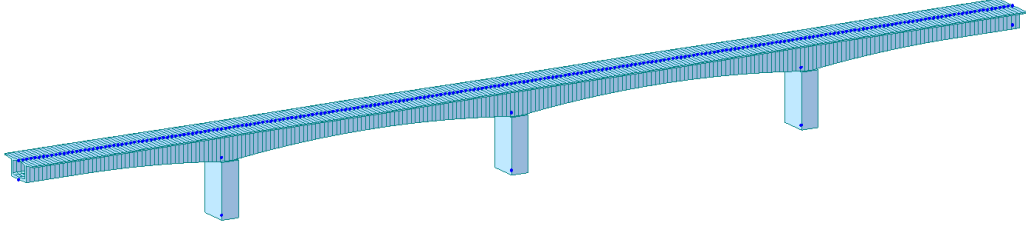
Finite element model of prestressed concrete box girder bridge structure with 60–80–80–60 m spans of the North–South high-speed railway project (Pre-feasibility study stage)
